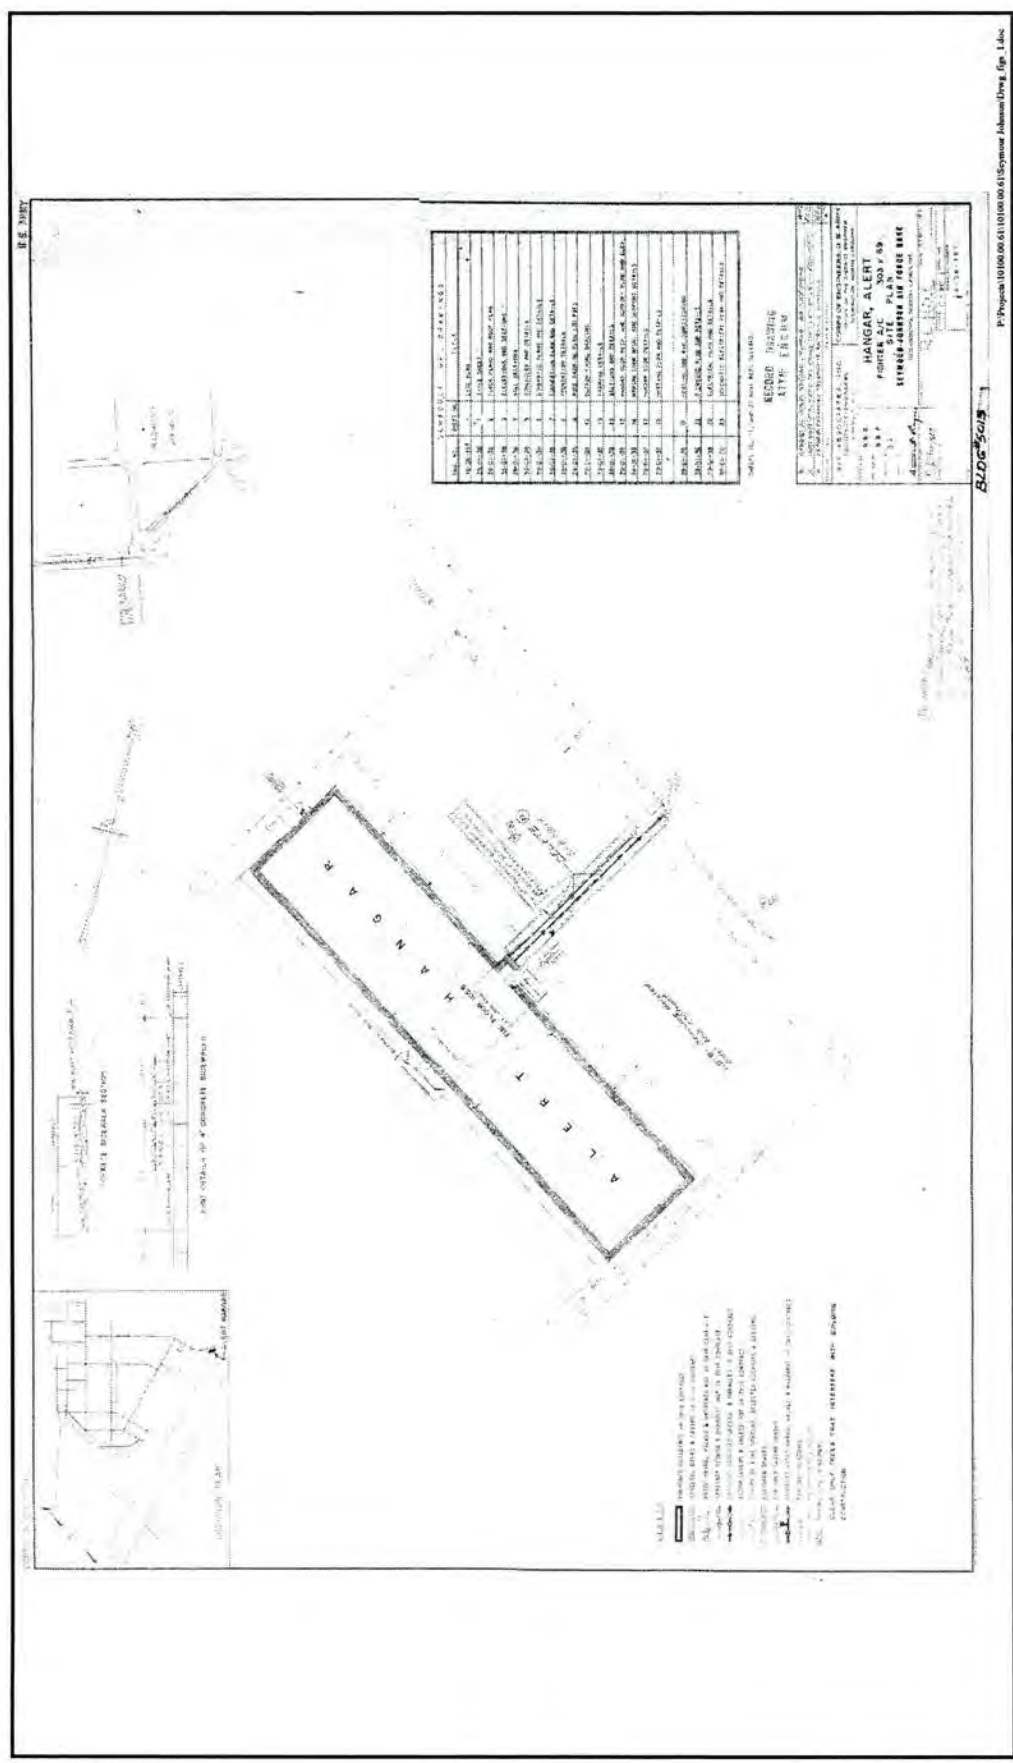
Building 5015—record drawing, site plan, 1956 (Source: Seymour Johnson Air Force Base Civil Engineering Vault)
